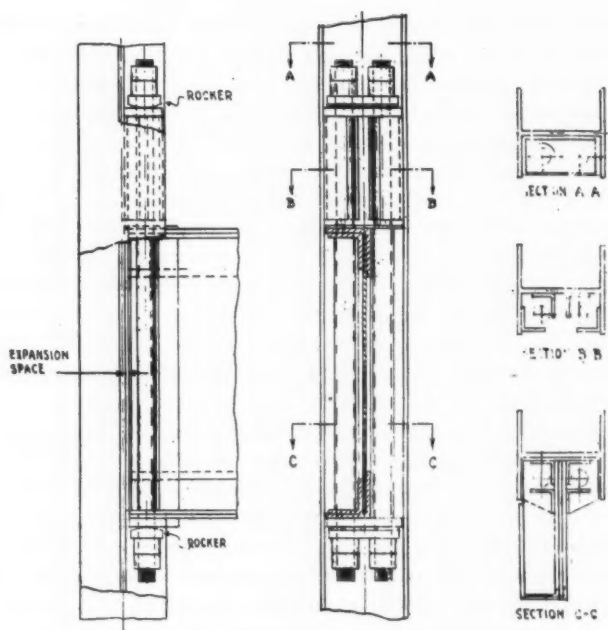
Girder supported on hangers with rockers to allow for expansion
